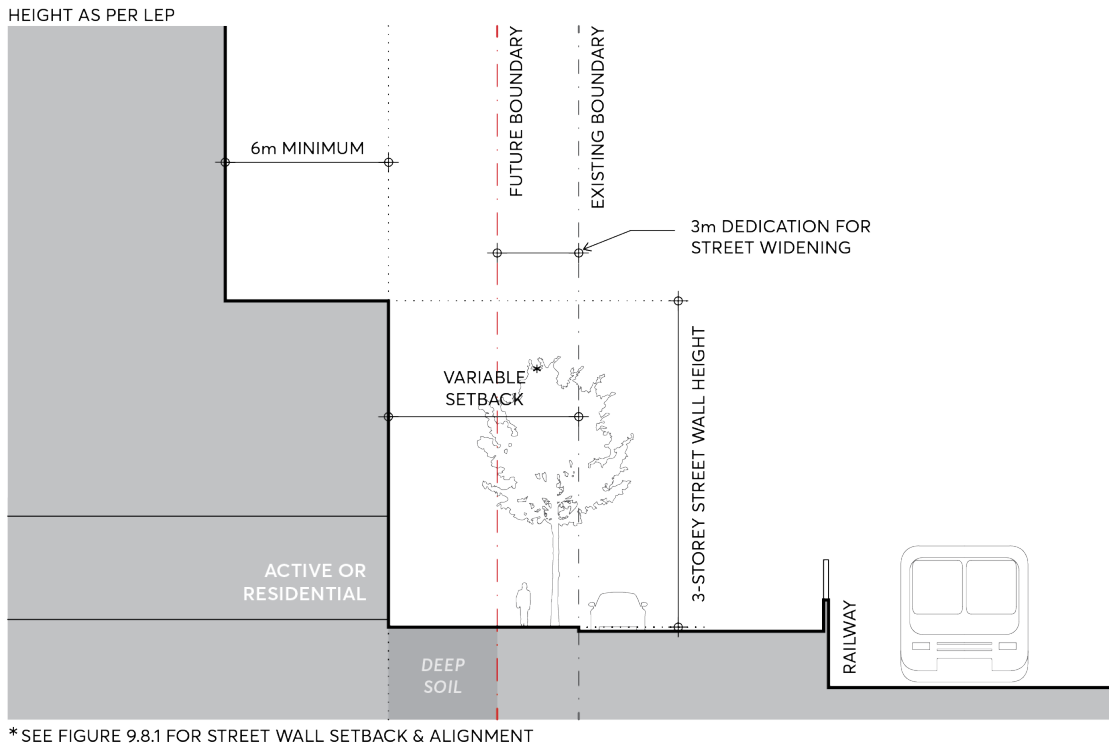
Station Street West (Section A) Setbacks and Street Wall Height
